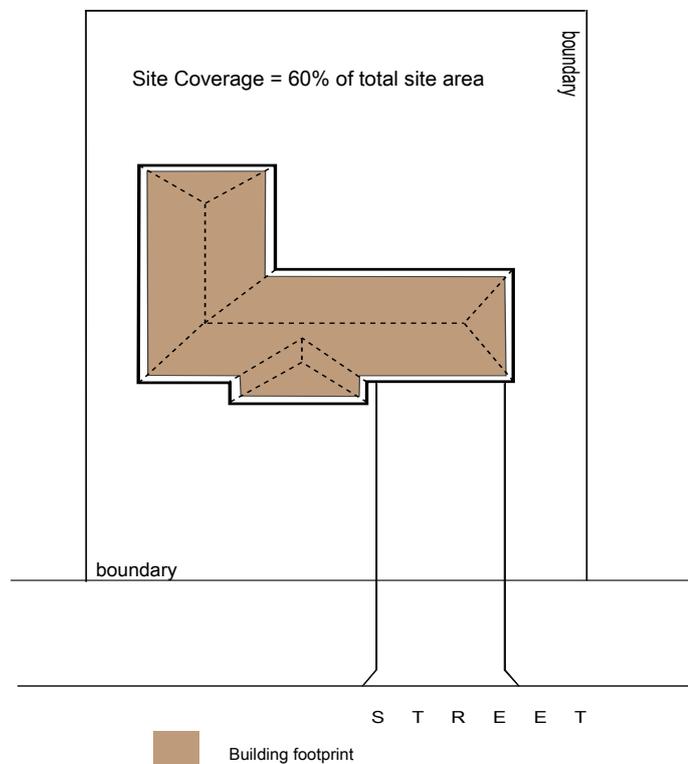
Site Coverage- Single Dwellings, alterations/additions and outbuildings
